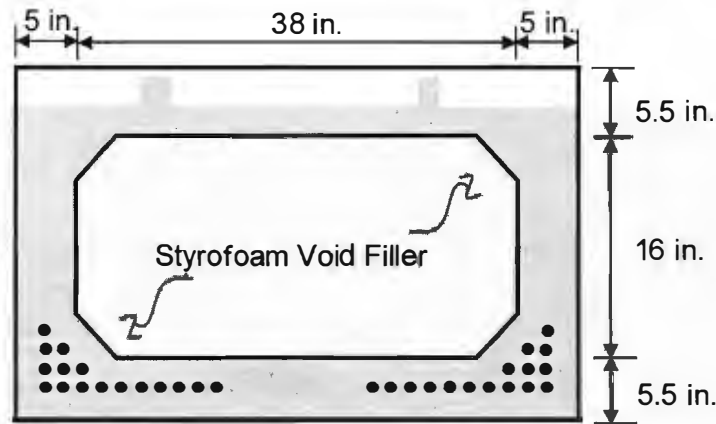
Cross section of box girders from Heldenfels Brothers, Inc. (San Marcos)
